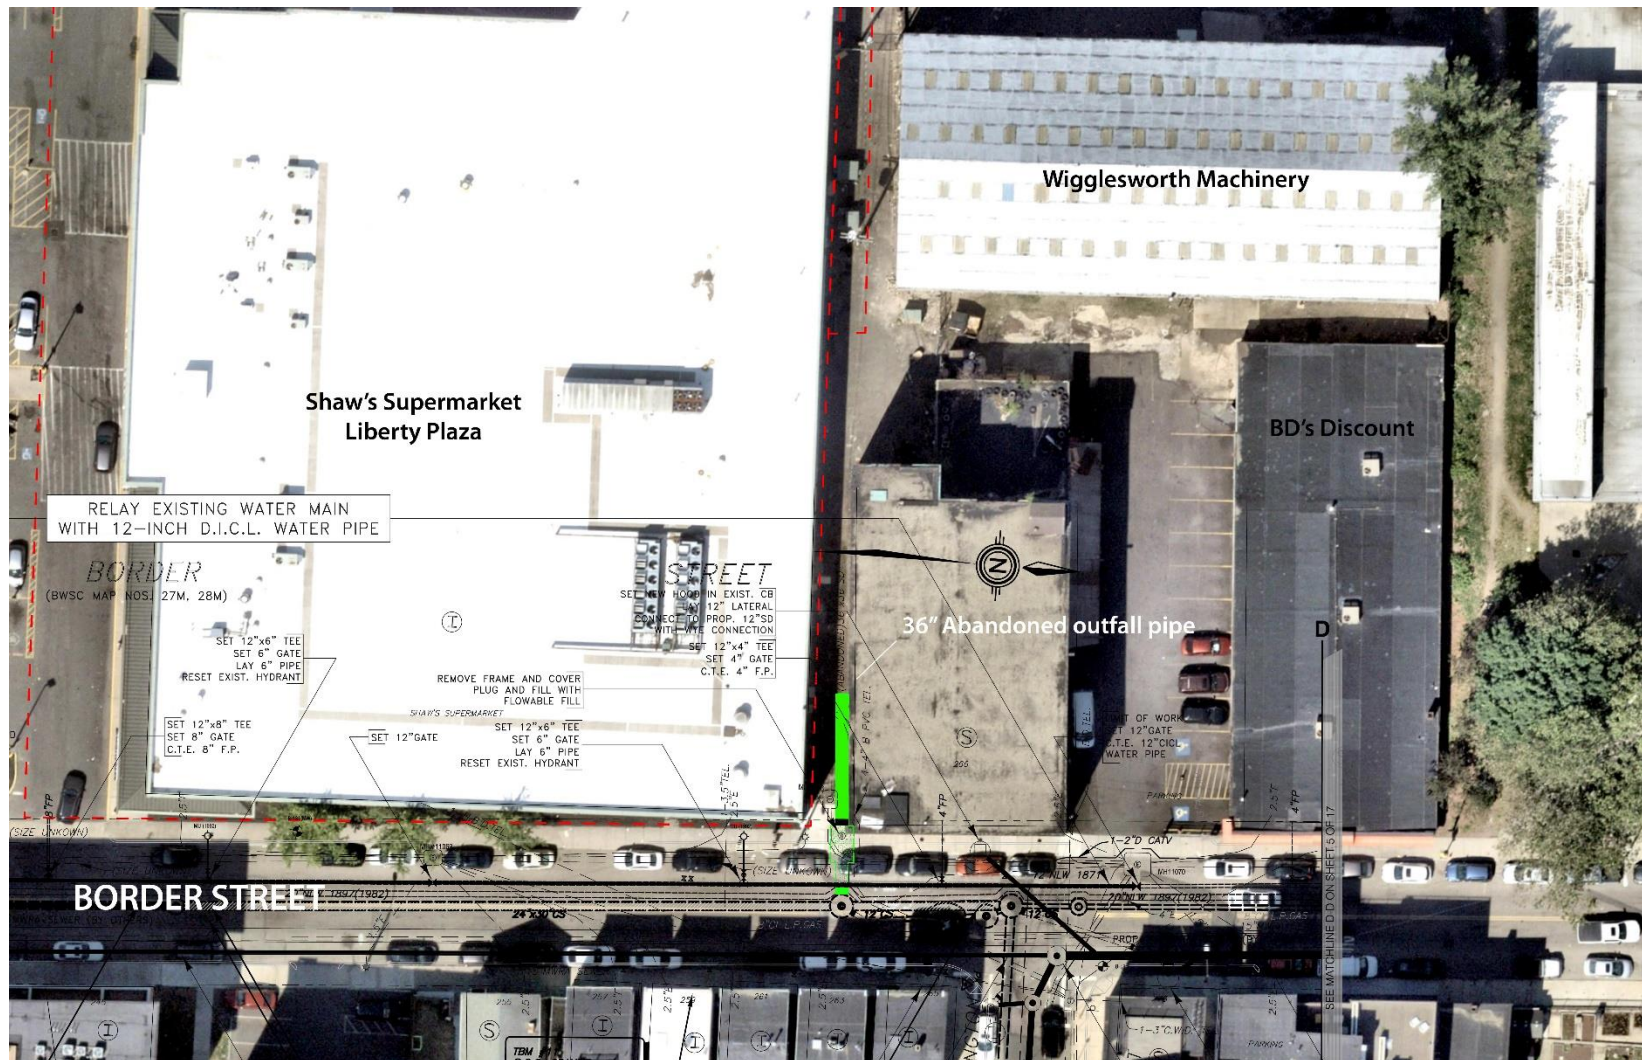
Abandoned 36" drainage outfall pipe north of Shaws Supermarket Property. Plan provided by BWSC.
